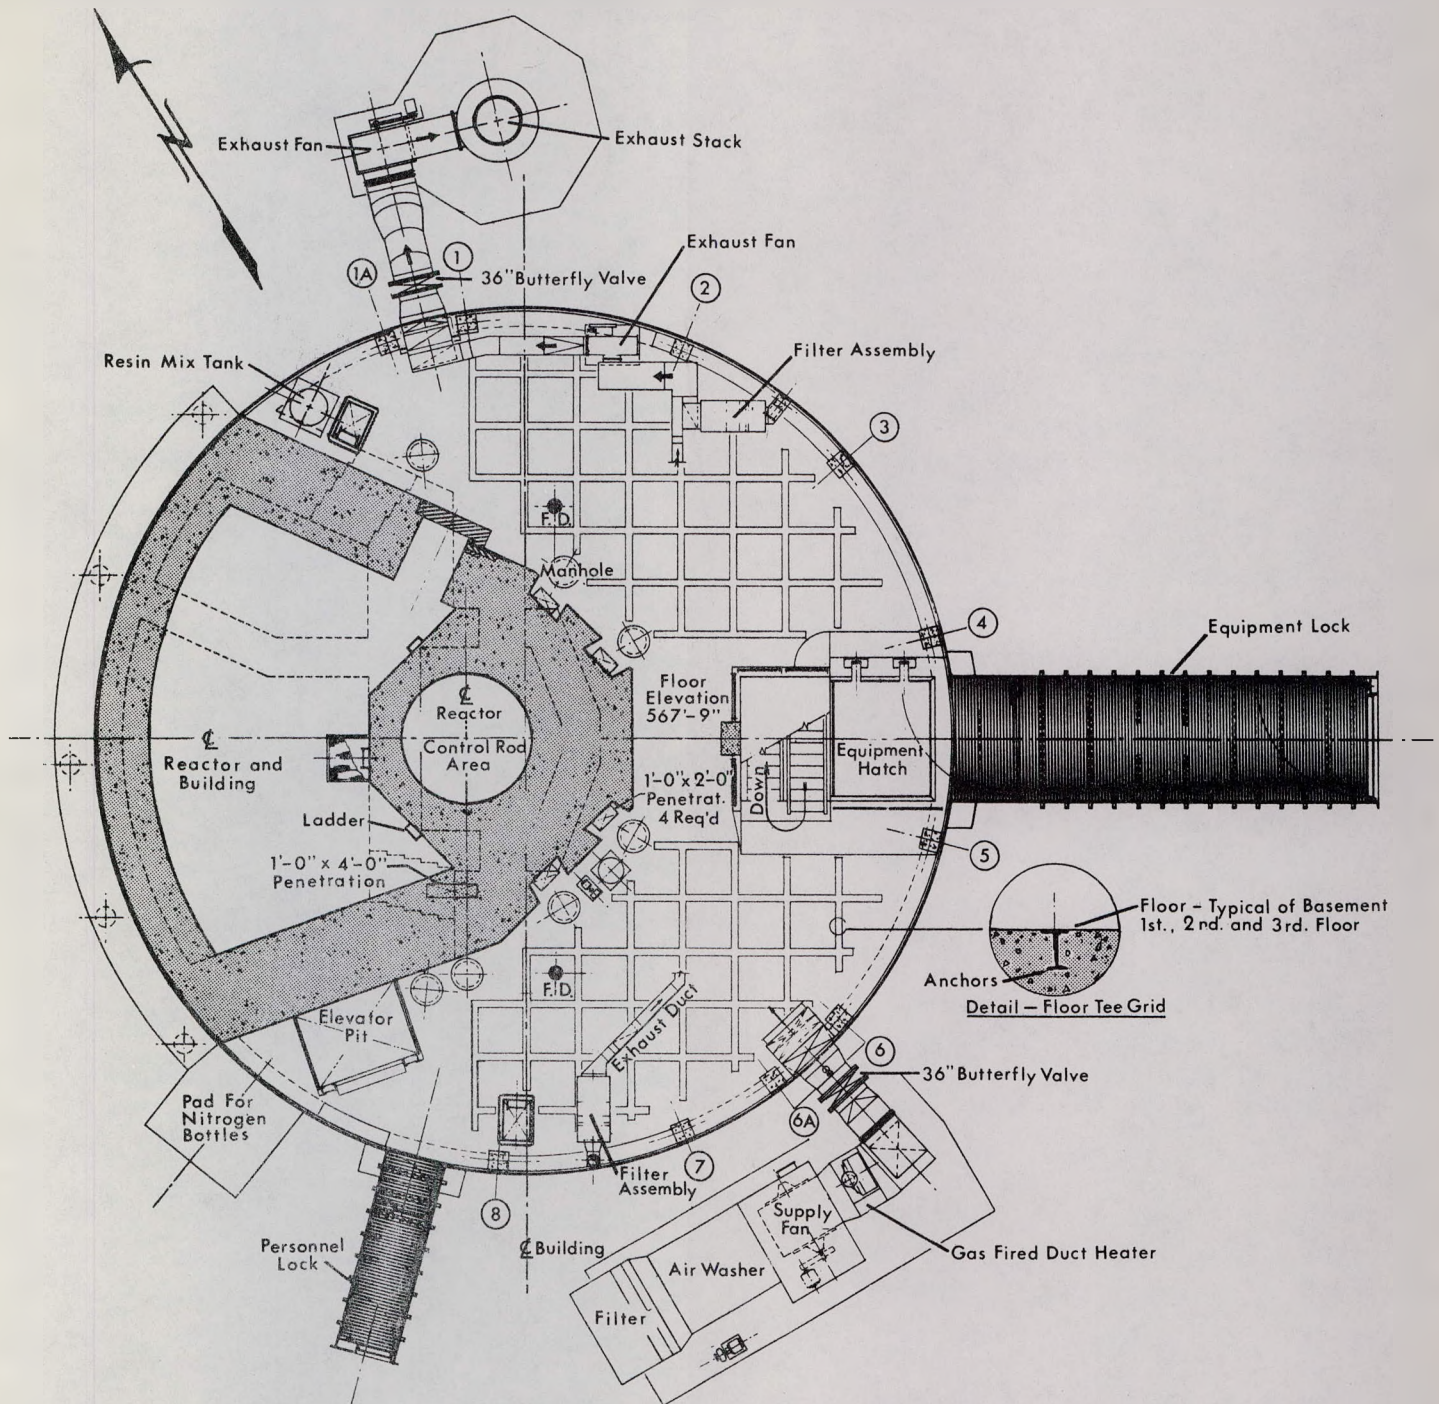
REACTOR BUILDING FIRST FLOOR PLAN
